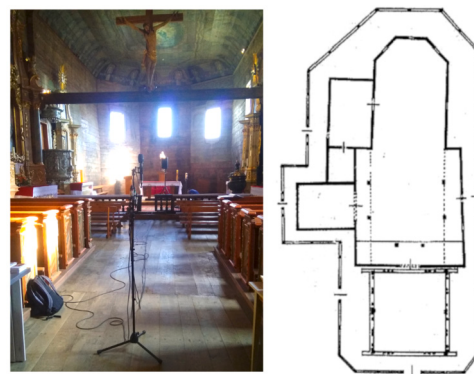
Interior photograph and floor plan of the Assumption of the Blessed Virgin Mary and St. Michael the Archangel Church in Haczów.
